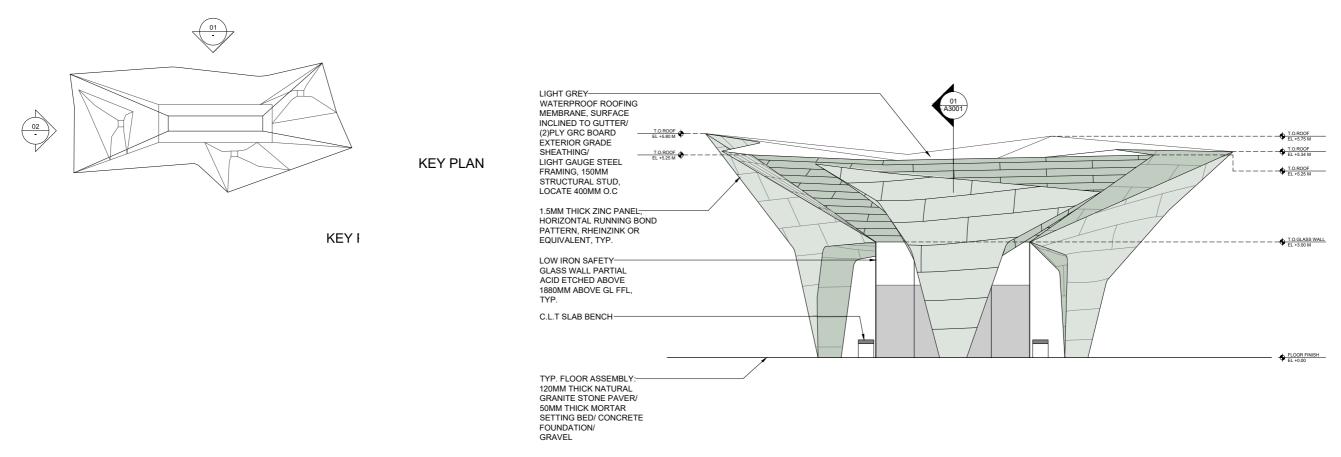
BUS INTERCHANGE E. SHELTER ELEVATION, SCALE=1/100
